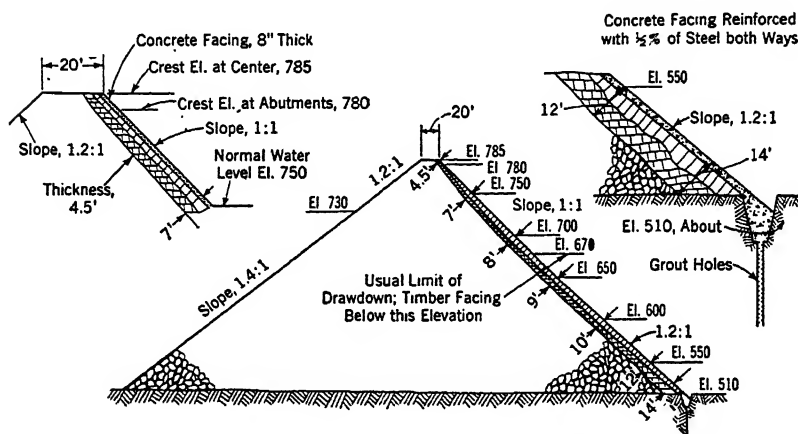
Dix River rock-fill dam—rubble, concrete, and timber facing on upstream side. (*Eng. News-Record*, Vol. 94, p. 1059.)
